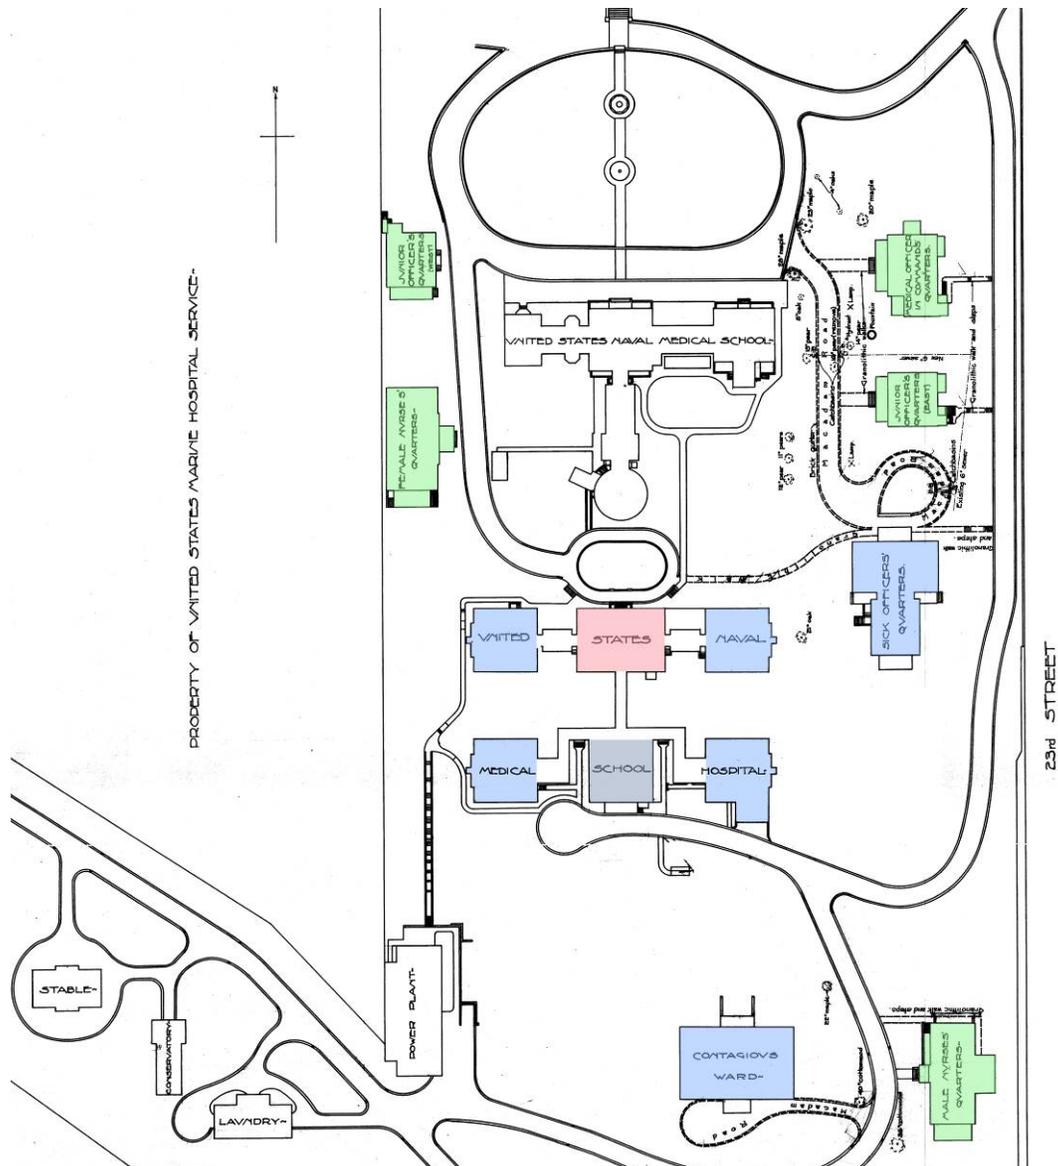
Site plan for Naval Hospital Washington, DC, circa 1910s (NARA College Park, RG 71-531).
